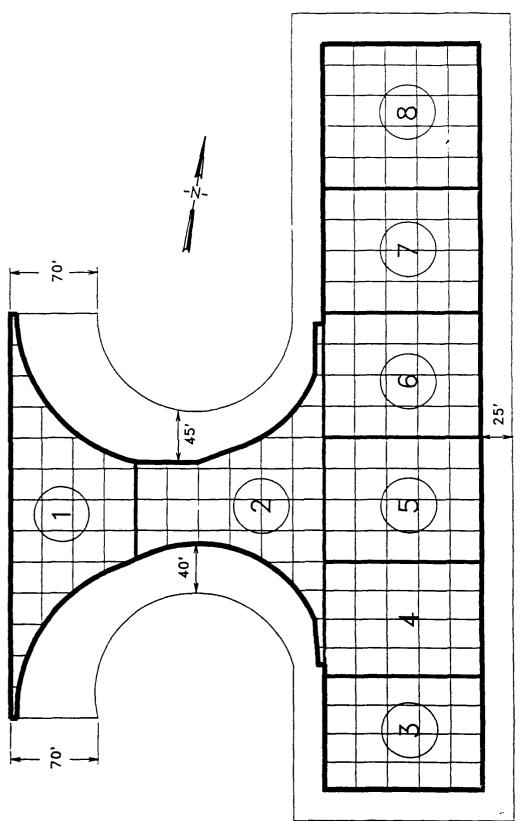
Sample unit layout, Pad 16 blast pad (feature A27B)
